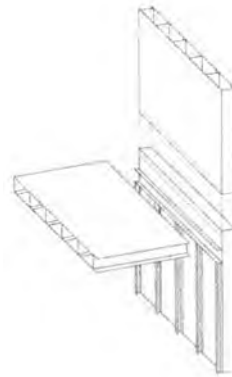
Balloon frame building method (steel-frame construction)⁹⁵
